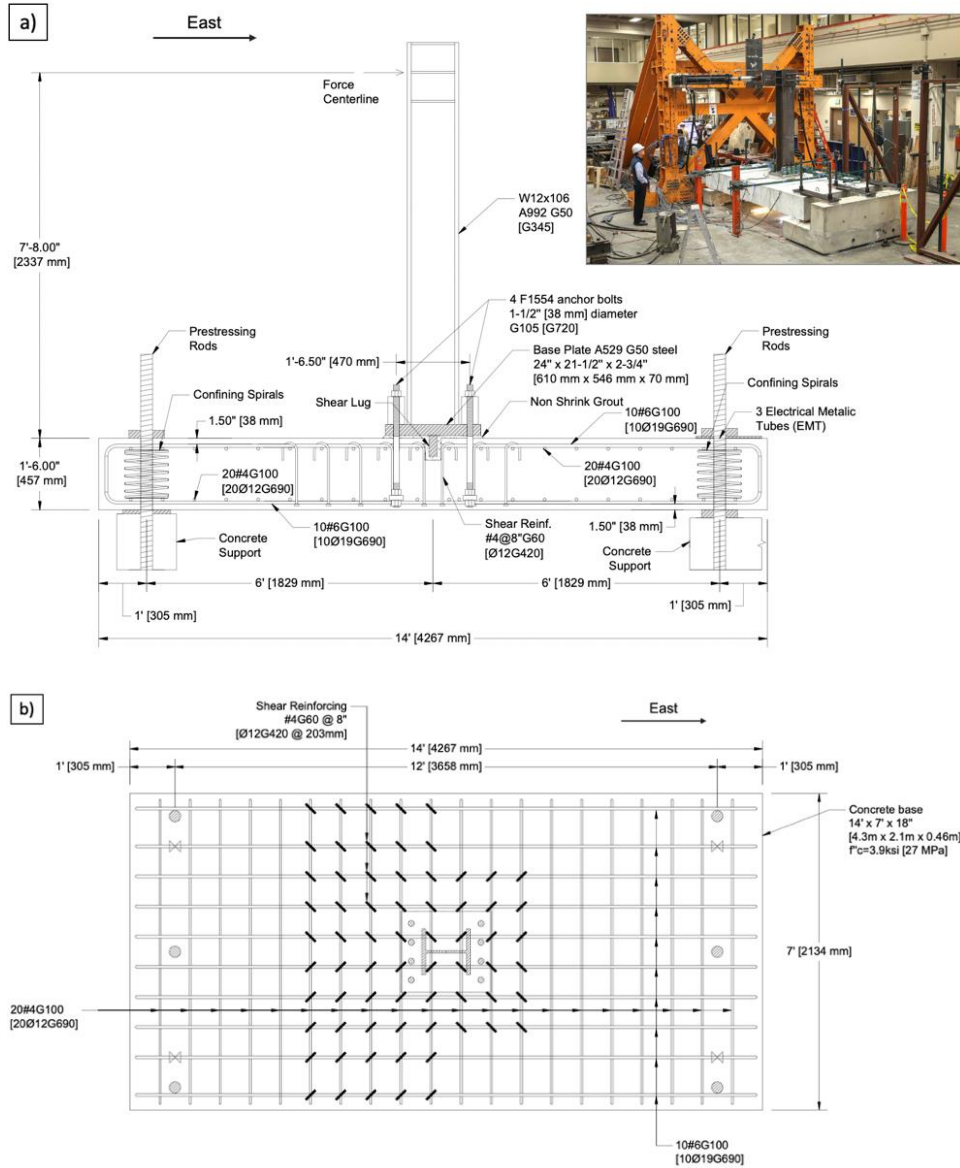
Elevation (a) and plan view (b) of test specimen M02; photo inset of test setup [1]
